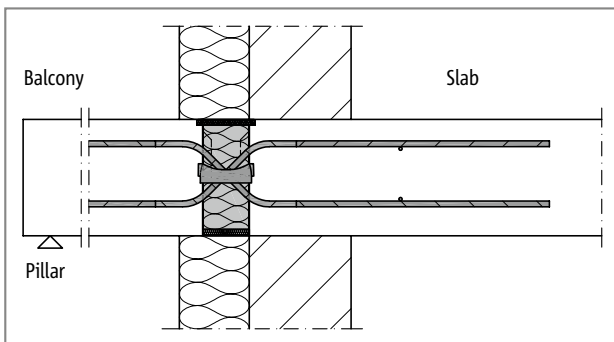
Schöck Isokorb® T type Q-E-VV: Connection for exterior insulation
